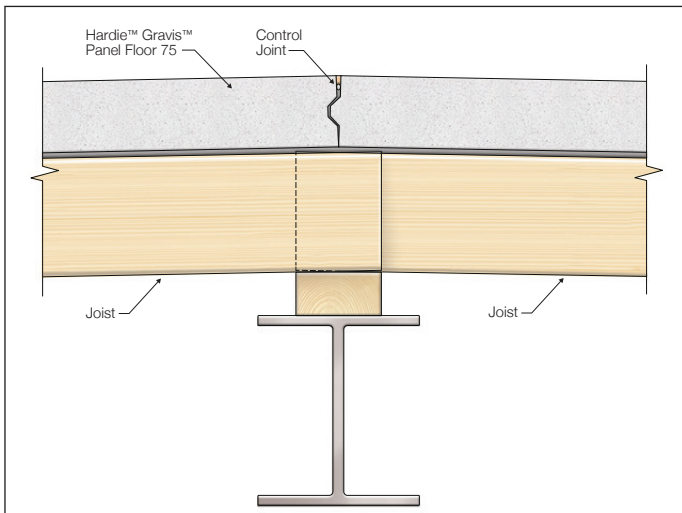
CONTROL JOINT LOCATION FOR BEARER OR SUPPORT WALL
